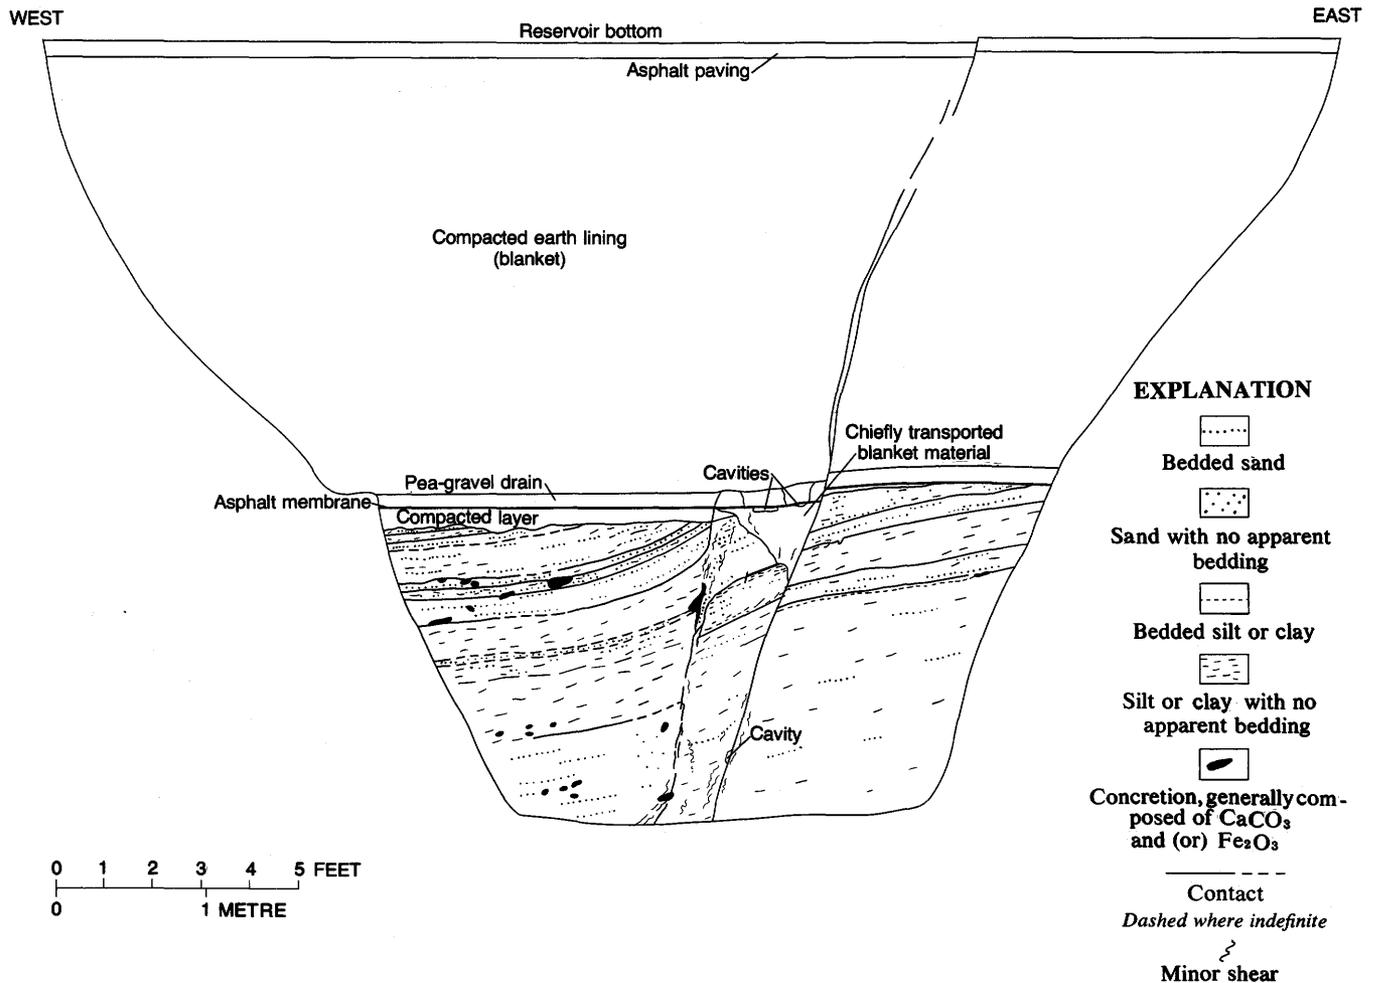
Drawing of north face of California Department of Water Resources excavation 2 intersecting earth crack IX. See figure 22 for location. Modified after California Department of Water Resources (1964, pl. 22e).
